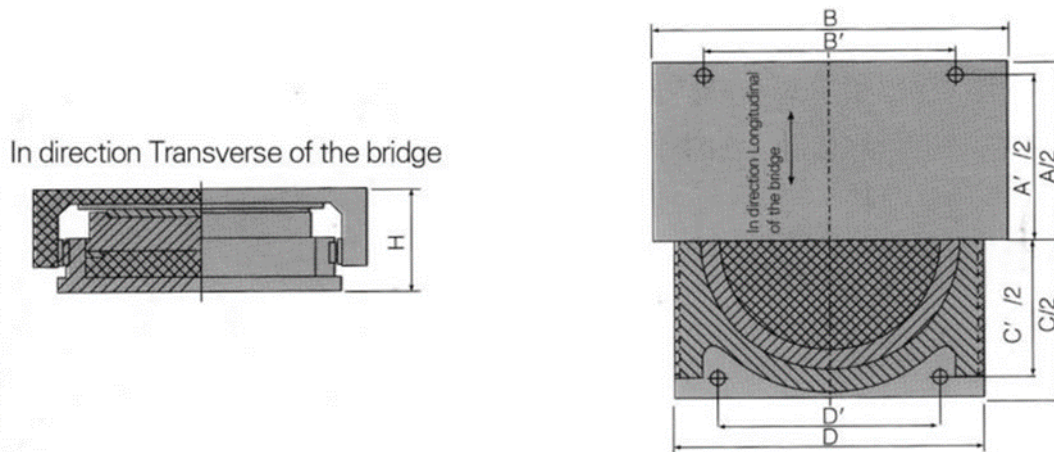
Cross-Sectional View of a Guided Pot Bearing
